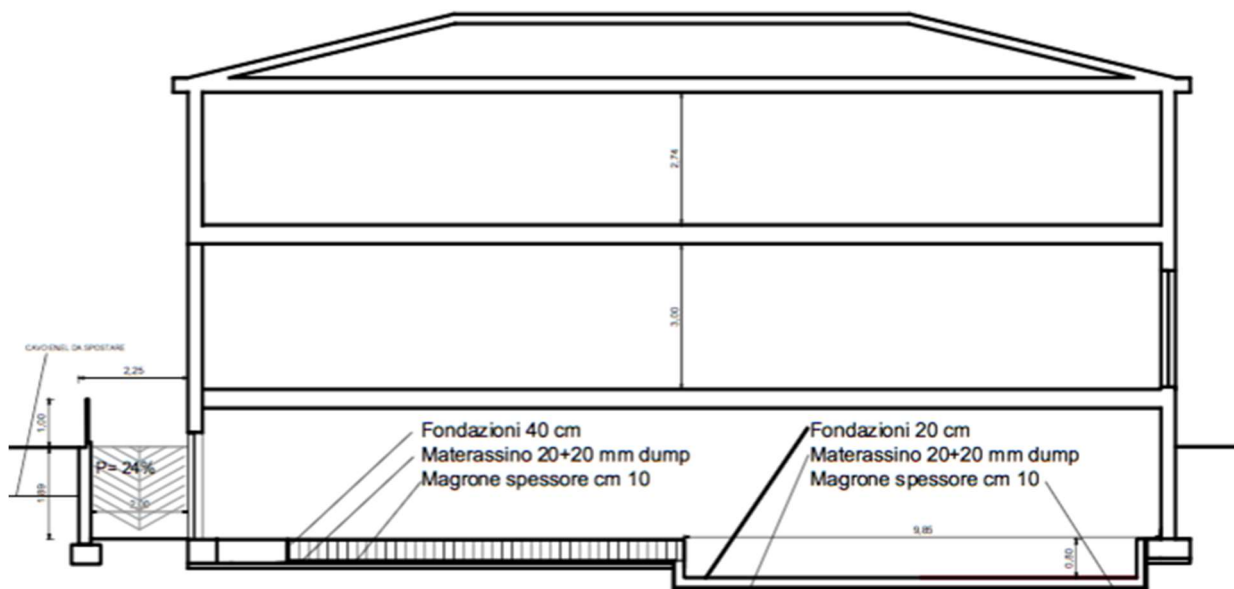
sectional view of the new laboratory that will house BEaTriX: all the facility will be mounted on a heavy concrete basement laid on a damping rubber layer to avoid the propagation of vibrations from the ground to the optical elements.
